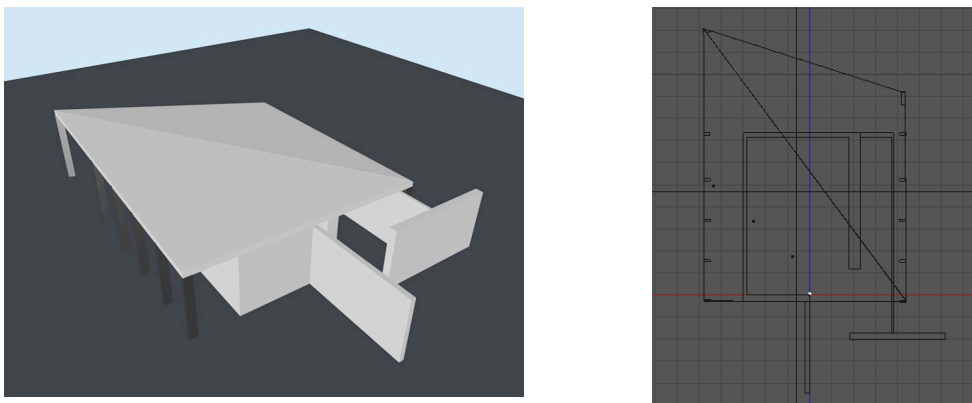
Plan with pillars and roof. On the right, C4D top view
